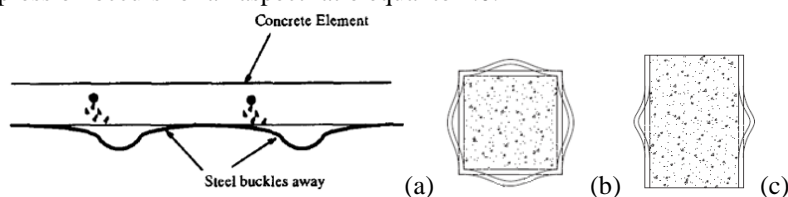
Buckling mode: of the steel plate constrained by concrete (Uy and Bradford, 1996) (a); transversal in a box section (b) and longitudinal in a box section (c)
